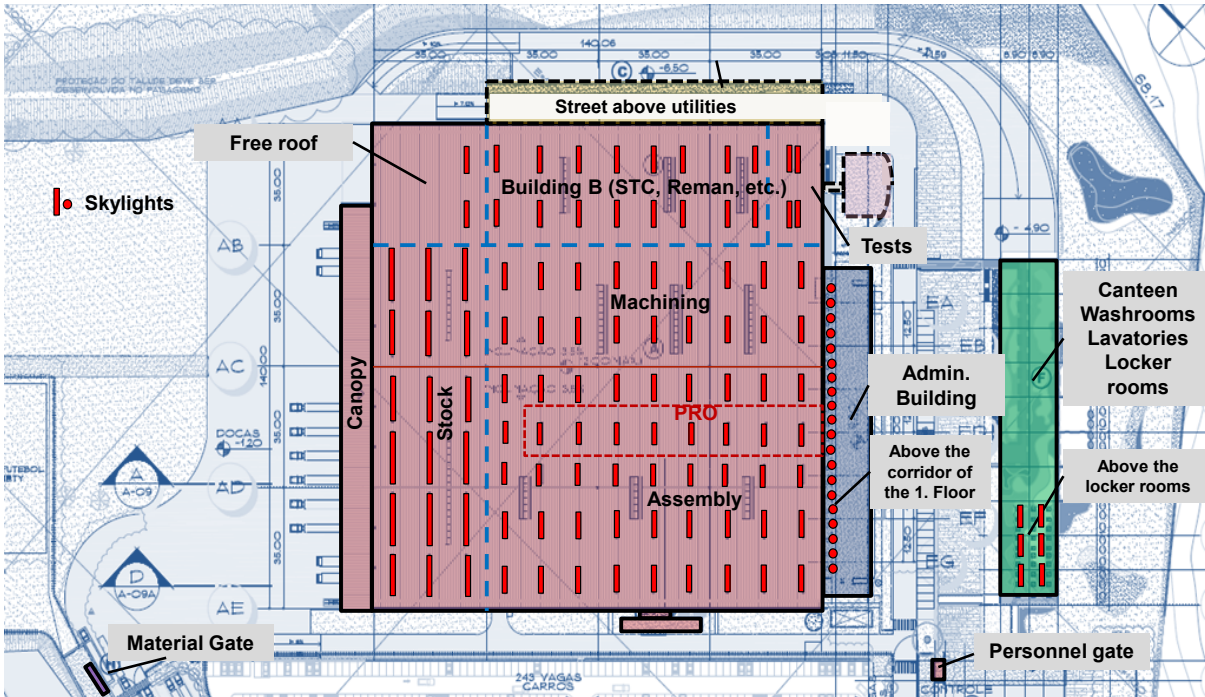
Plan of skylights in the factory building Knorr-Bremse in Itupeva, Brazil (2012).
